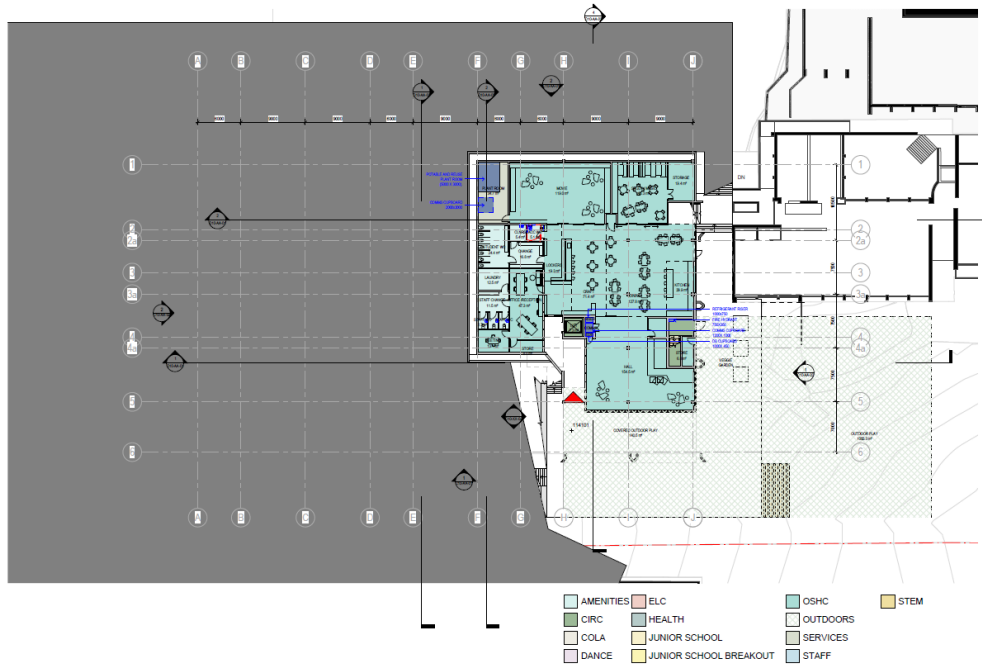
Proposed General Arrangement Plan - Level 00. (Source: BVN)
